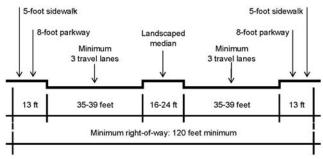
Walnut Street (Between Ball Road and Goodhue Avenue) Cross Section
